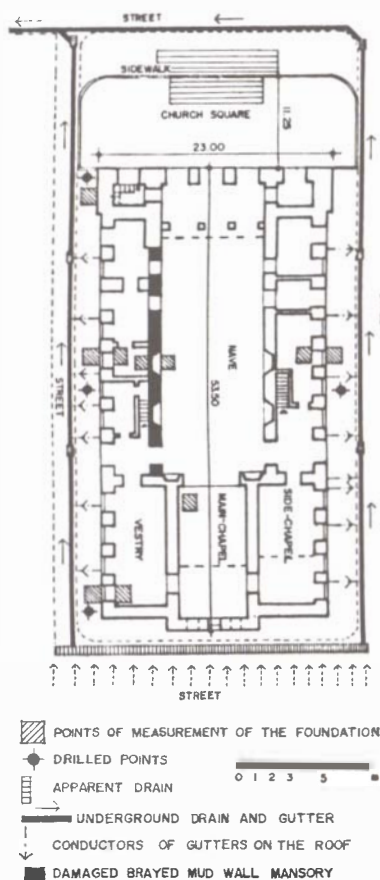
Ground floor plan of Our Lady of Pillar. Illustration by Lima.
